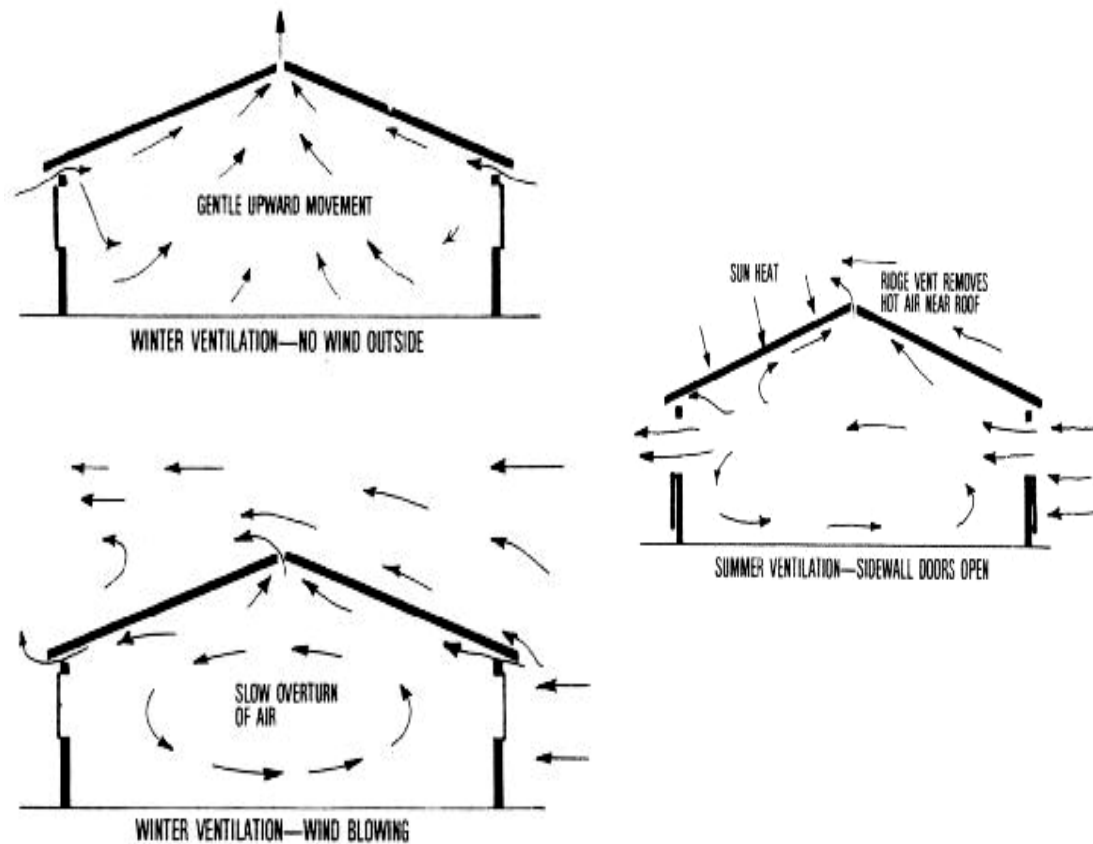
Natural ventilation in a gable-roof building occurs primarily because of the wind blowing over the ridge and, to a lesser degree, because of the temperature difference inside and out.
